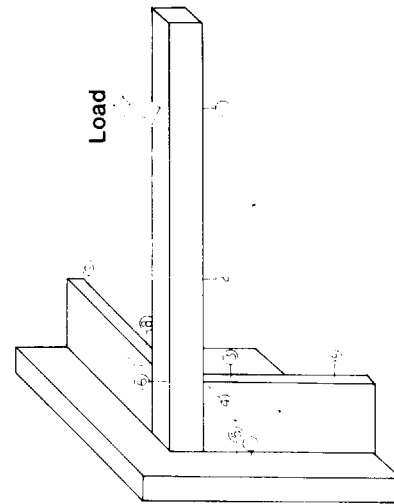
Diagram showing the arrangement of a joint specimen for testing.
